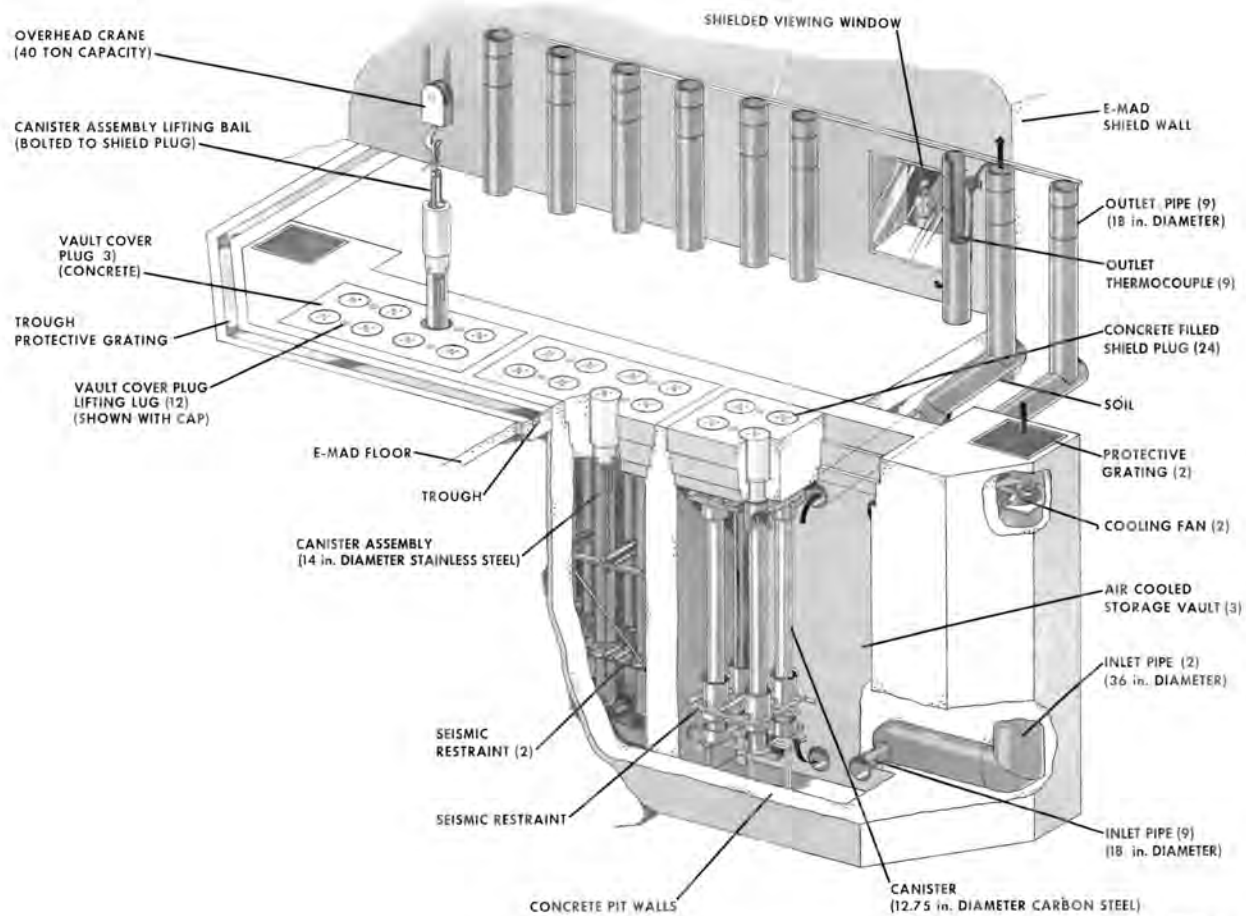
E-MAD Lag Storage Pit Configuration
